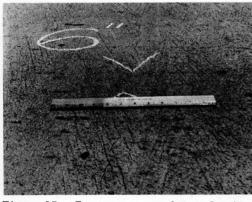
Transverse crack on frontage road, 6-in. pavement (Tarrant County Project).
